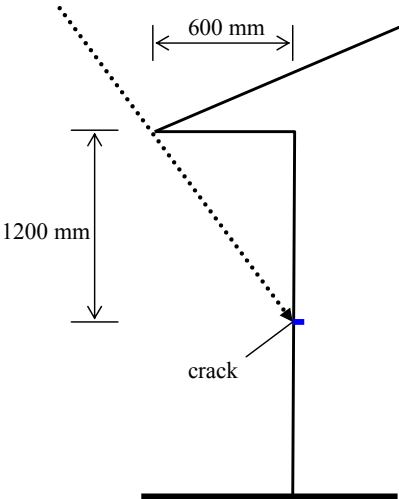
Wind driven rain drops on a wall with an eave.
